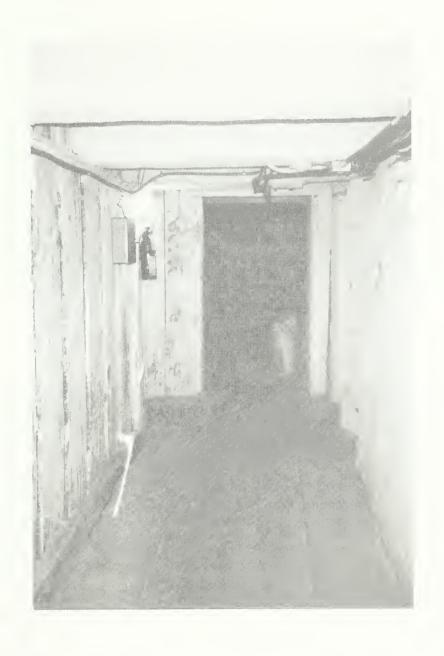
Cellar hall (Room 001), looking north to doorway D003.
